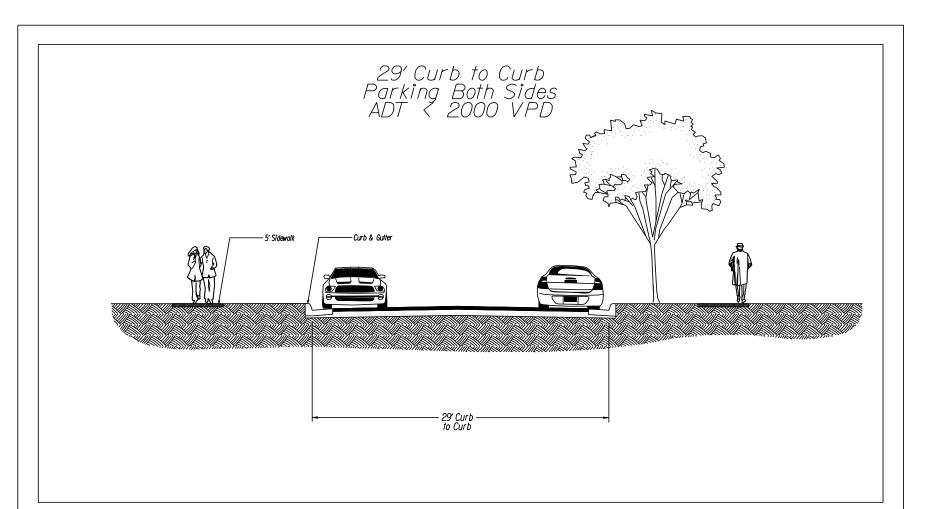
29' CURB TO CURB PARKING ON BOTH SIDES\
